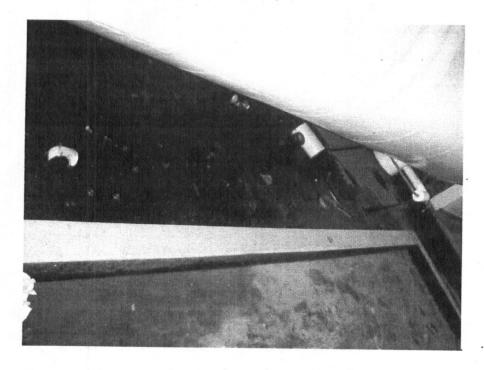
Facing south; view of fuel piping entering Building 13 within vault in southwestern corner of the building.
